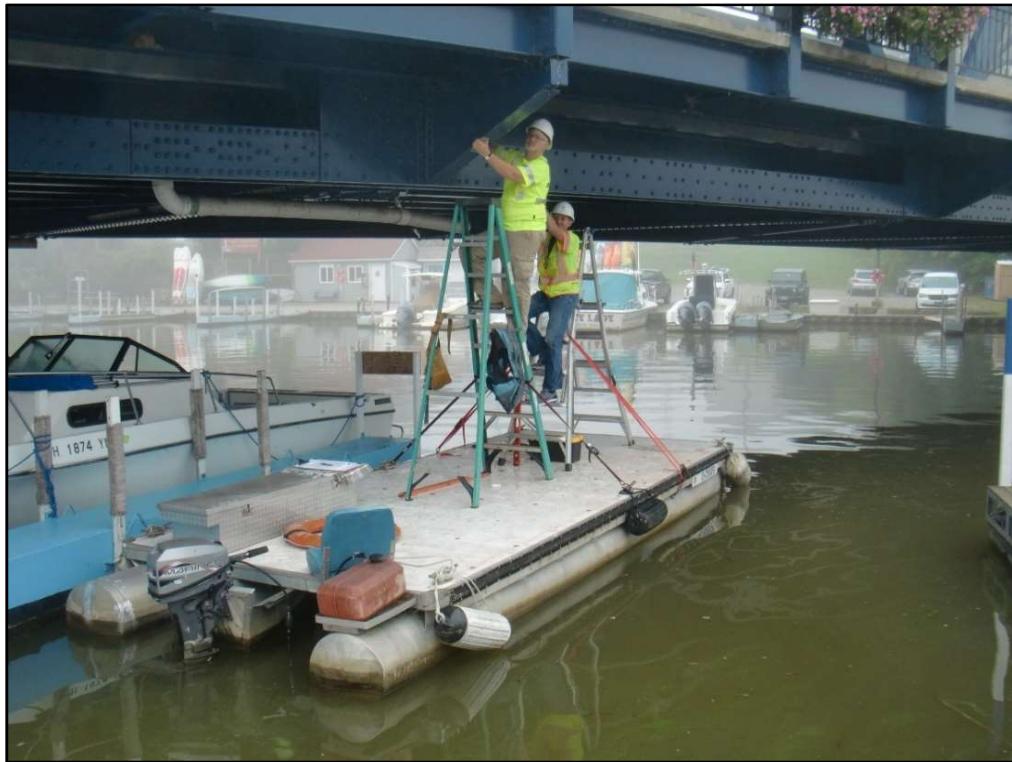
Lower Chord & Floor System Inspection with a Pontoon Boat & Step Ladders
